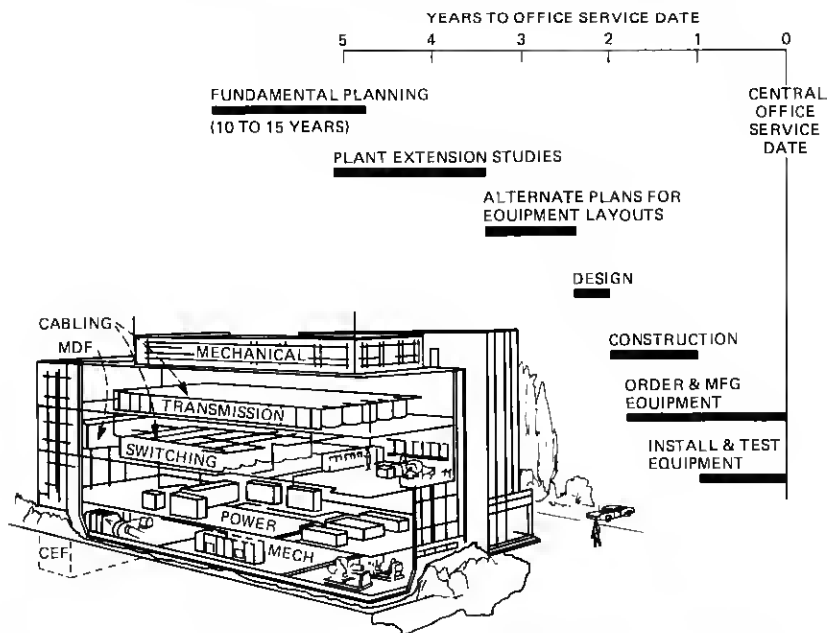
Typical central office planning process. The isometric building illustration shows the types of space and equipment.
